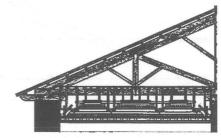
S. Paolo f. l. m.: cross-section and roof-trusses of the nave. Letarouilly1874, Plate 335 (Detail)
